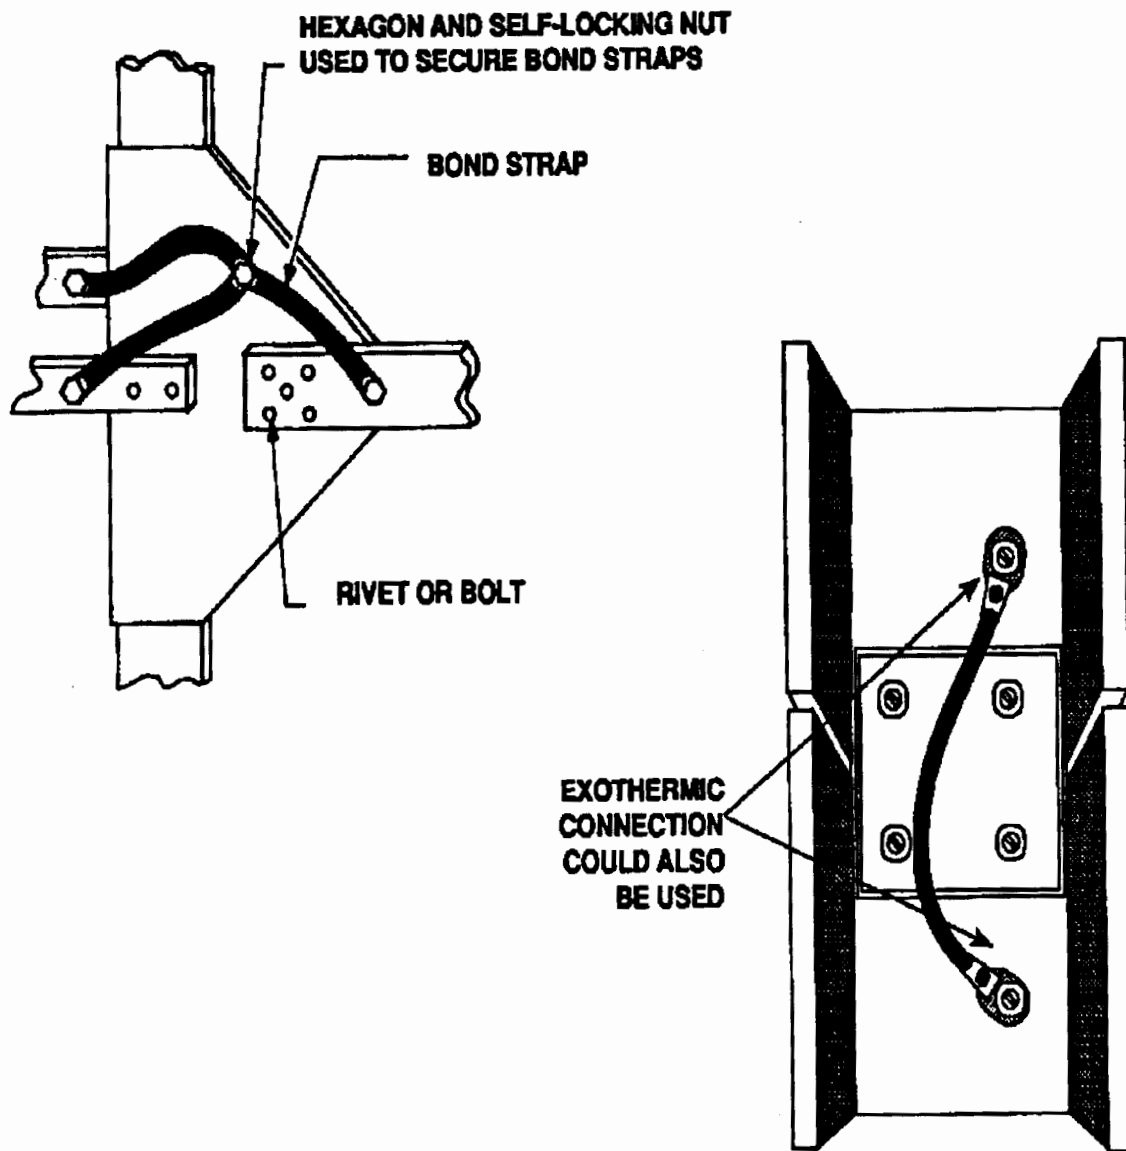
USE OF BONDING STRAPS FOR STRUCTURAL STEEL INTERCONNECTIONS
